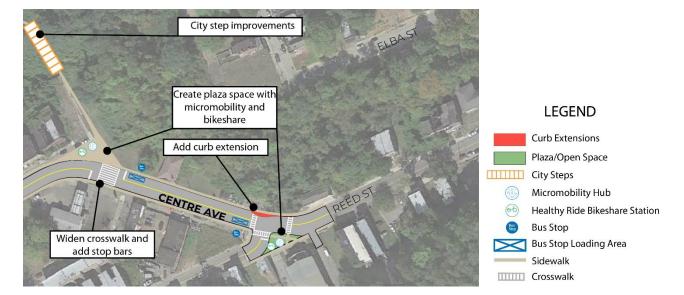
Proposed Enhancements along Centre Avenue at Reed Street and Chauncey City Steps Connection (1E)
